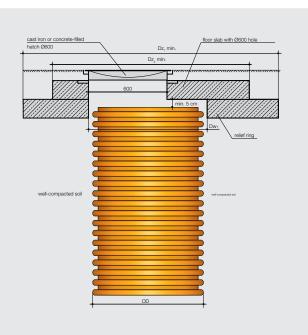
Example of a manhole solution – extension: manhole shaft or inspection shaft to the tank.
